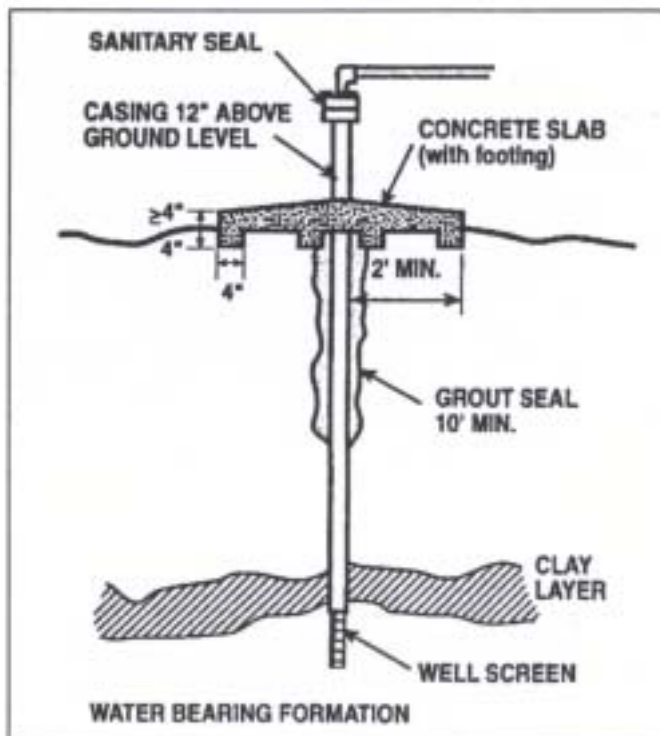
Typical Well Showing Proper Construction to Prevent Contamination
